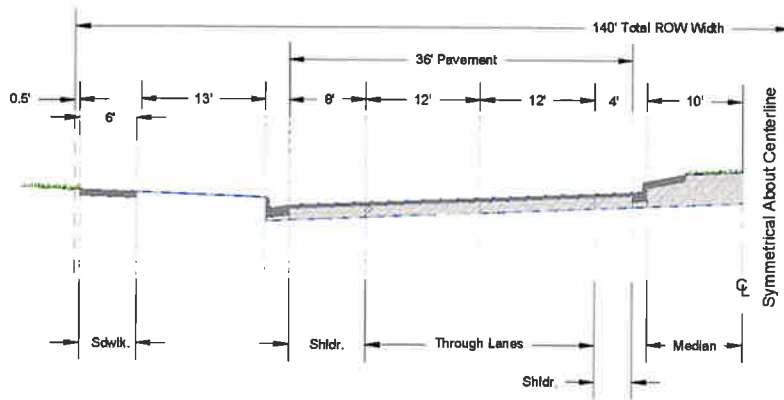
Typical Urban Expressway Cross Section (6 Lane)
